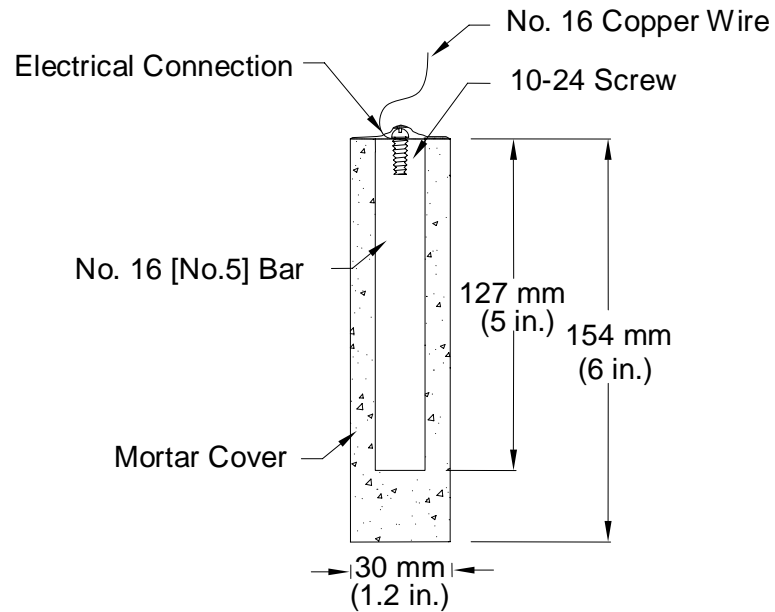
Cross-Section of Mortar-Wrapped Test Specimen Used for Rapid Macrocell Test
